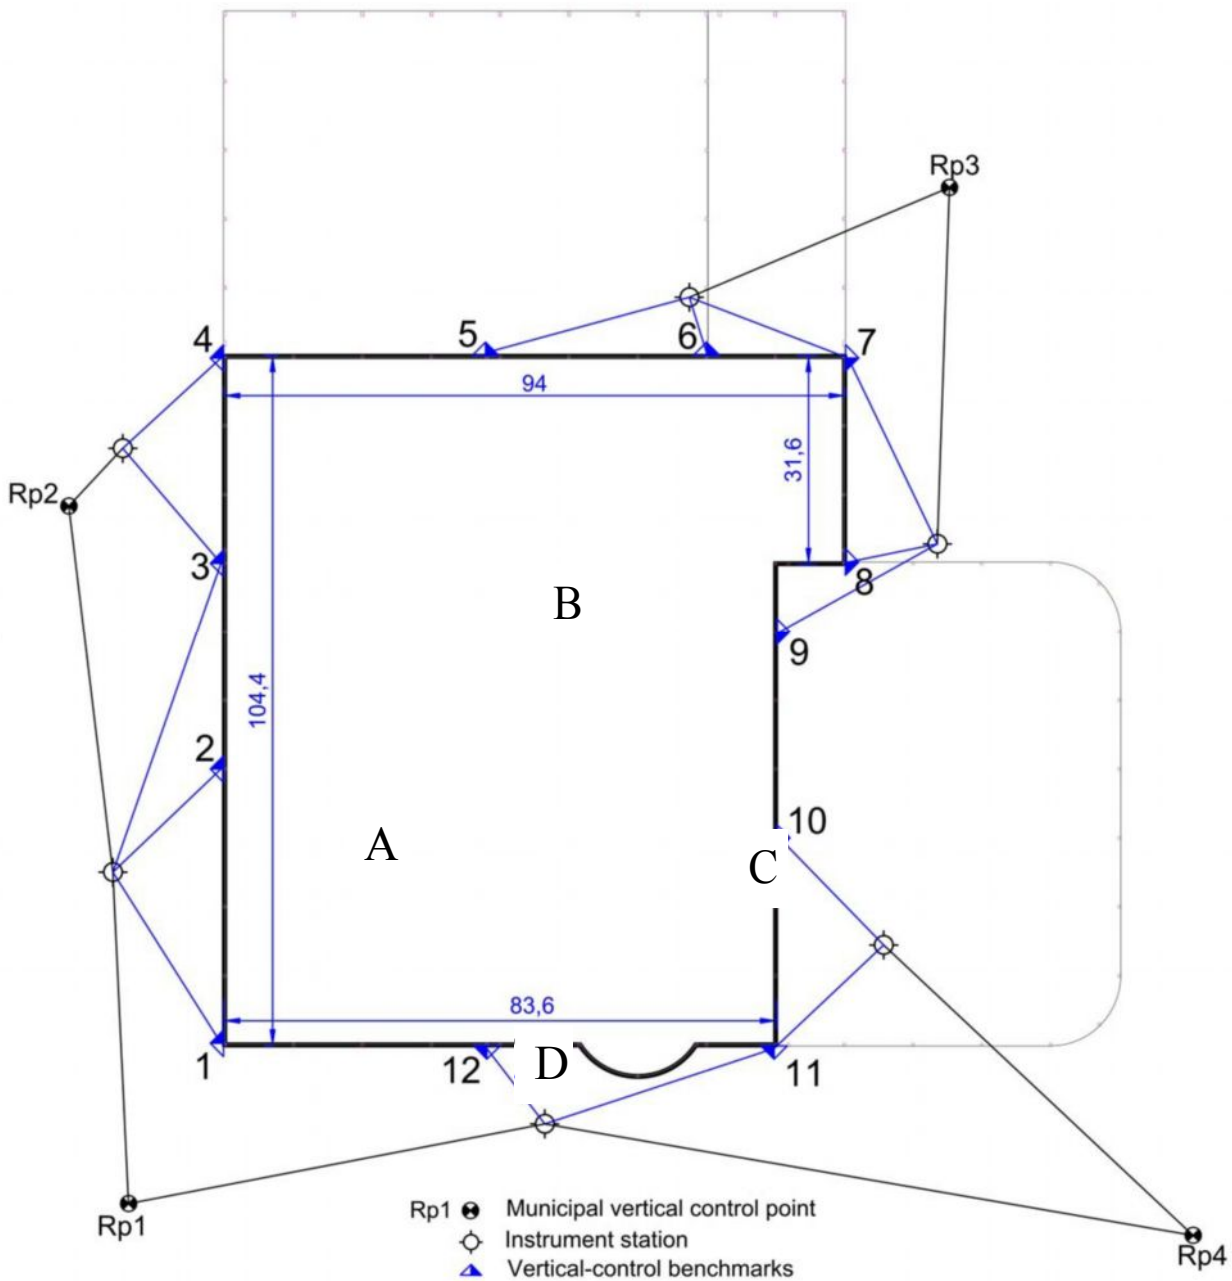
The surveying plan of the building with the location of the municipal vertical control point (Rp1 to Rp4), the stations of the instruments (6 unlabelled points) and the leveling benchmark (control points) on the wall of the building (1 to 12).
